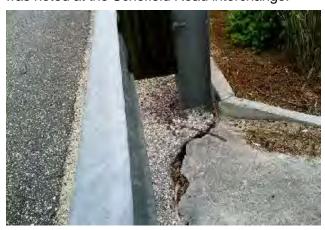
SR 429 wall gutter cracking Schofield Road
